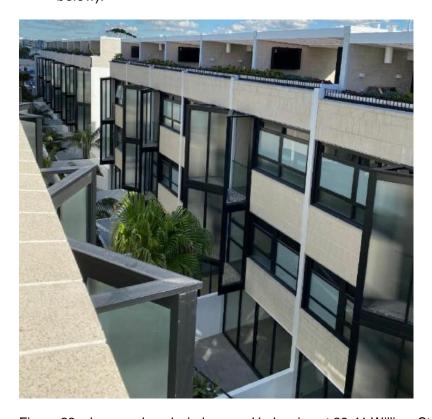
obscure-glazed windows and balconies at 29-41 William Street (source: applicant drawings)
